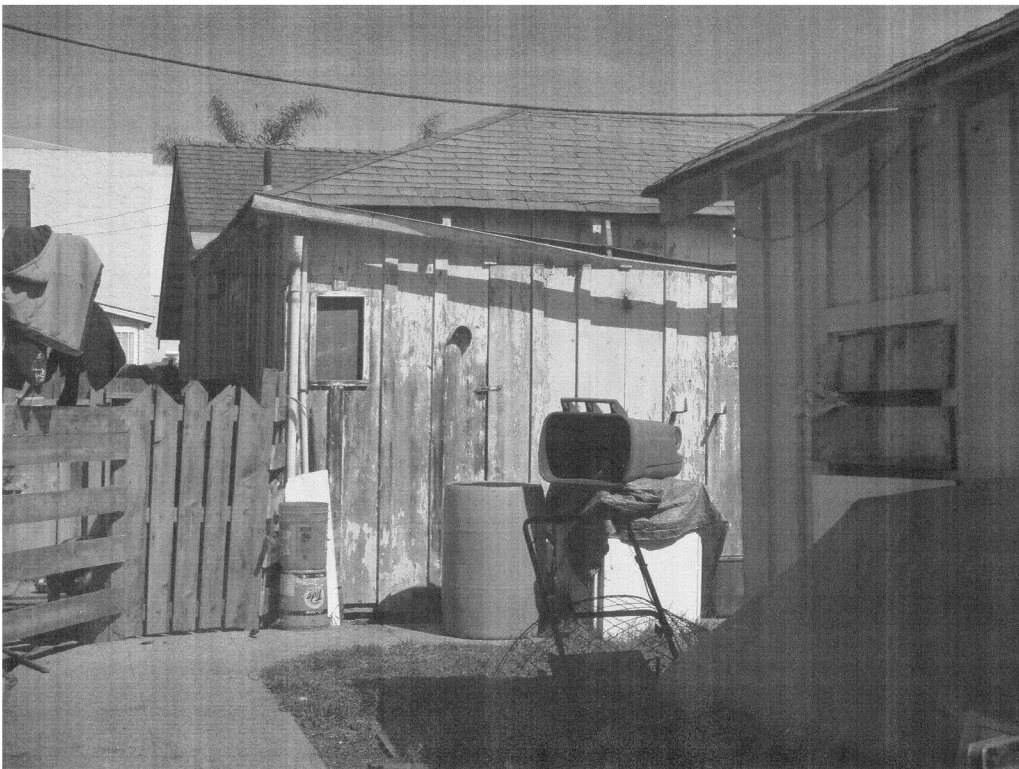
Looking east at the two deteriorated storage sheds just behind (south) the subject properties, Kent Seavey, May, 2019.
